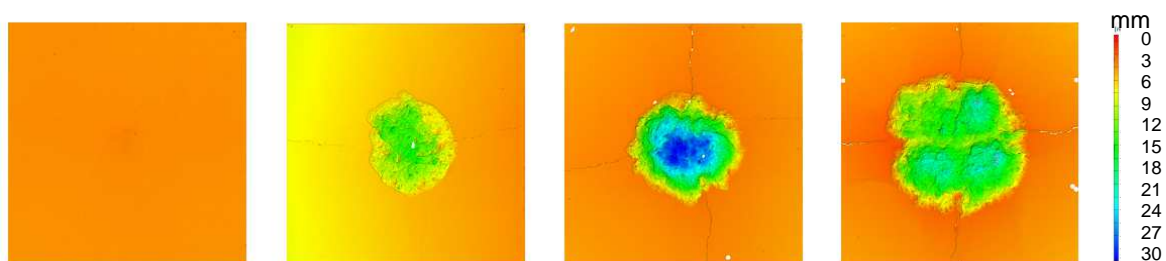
Explosive spalling and crack formation [48]
